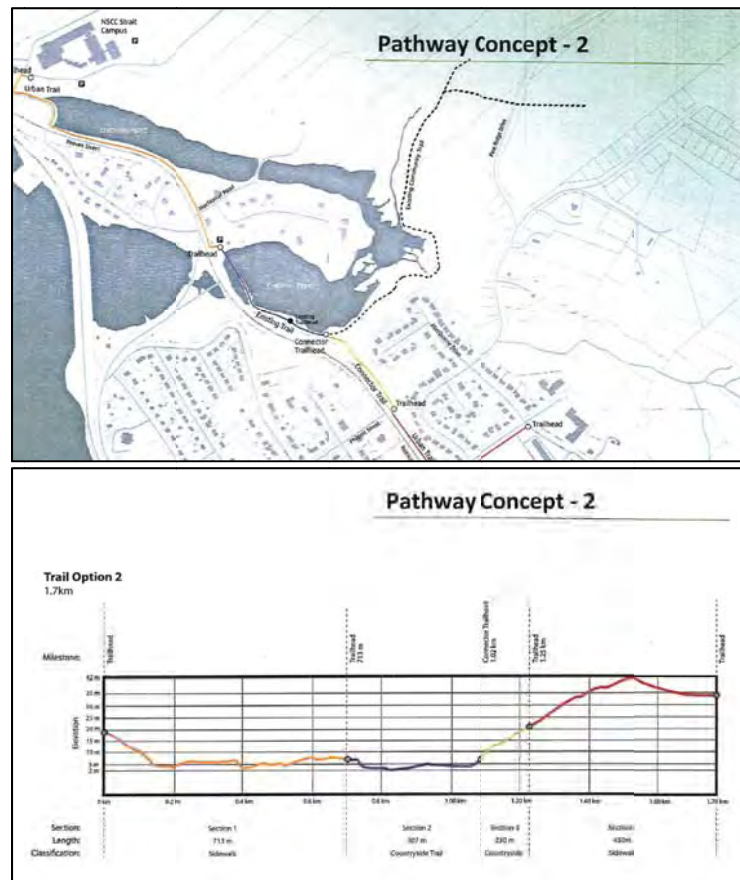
Pathway Concept on Reeves Street (Concept Plan / Preliminary Profile)
